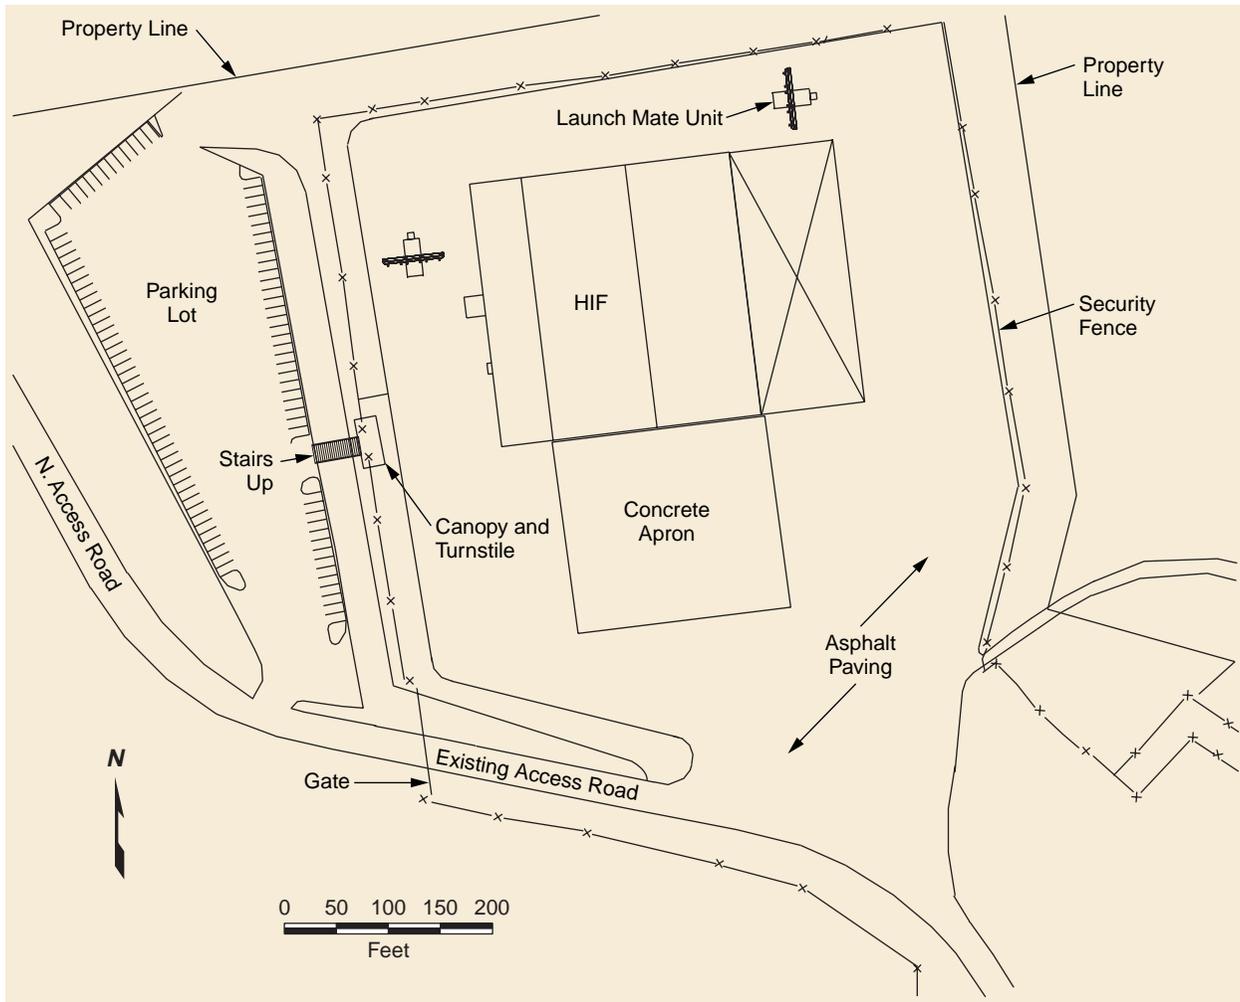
Horizontal Integration Facility (HIF) Site Plan
